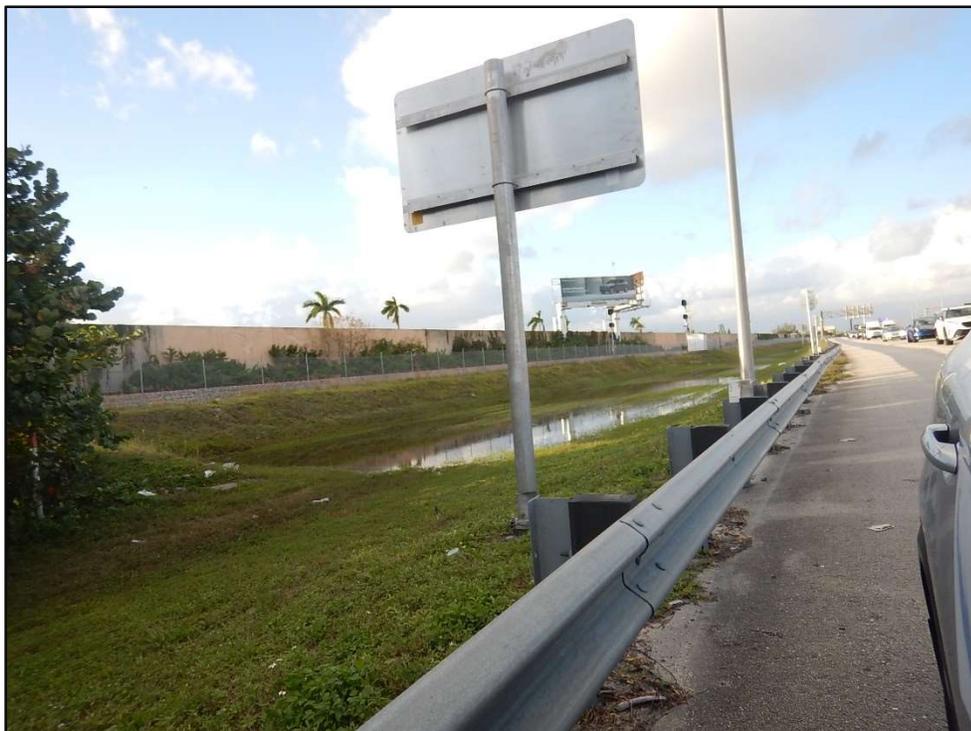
Swale-6 identified at the south project limit, west of I-95, south of Hallandale Beach Blvd.
